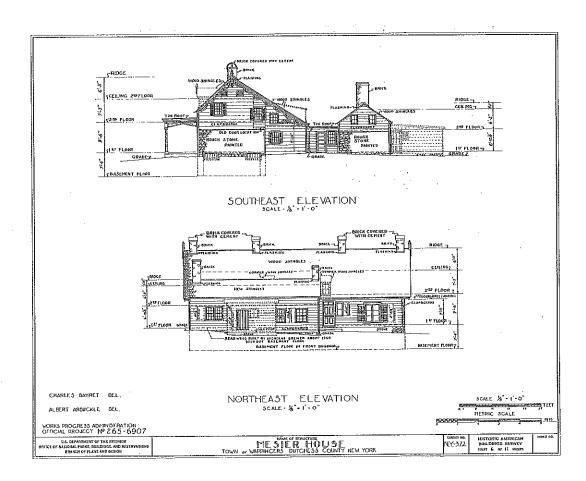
Historic American Building Survey drawing Southeast Elevation and Northeast Elevation, Mesier House. Works Progress Administration, c. 1933.
